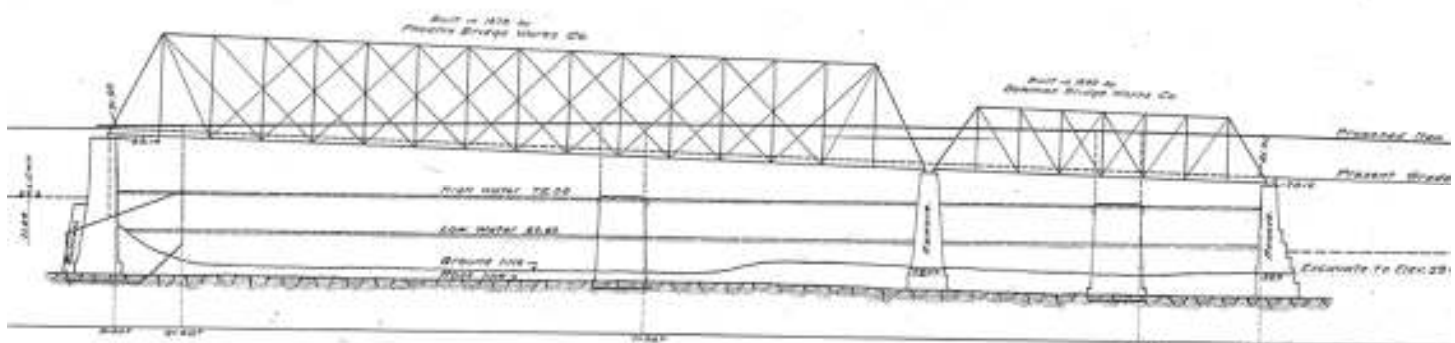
Elevation drawing of the Lorne Bridge in Adams' 1923 plans, elevations, and details
